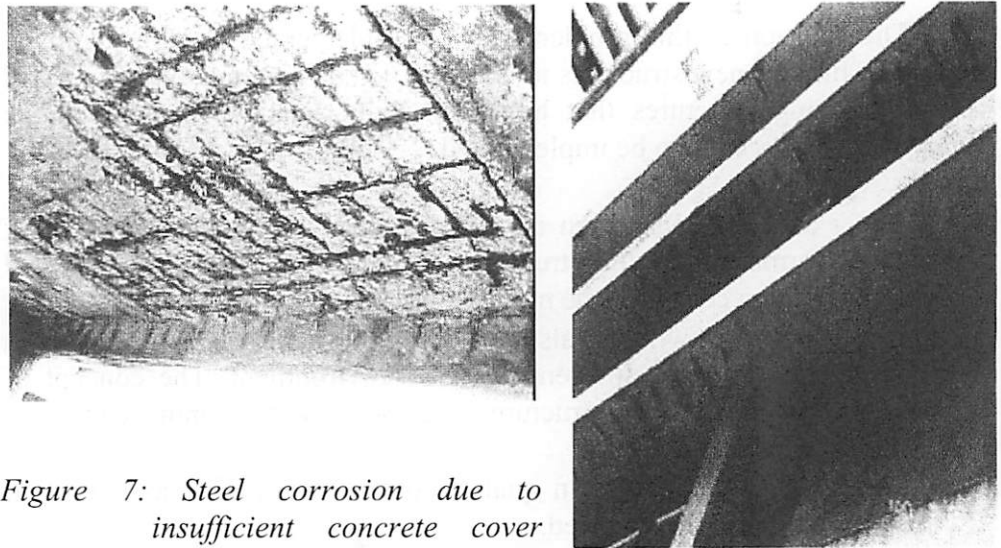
Steel corrosion due to insufficient concrete cover under bridge (left) and under building balconies (right) (Construction problem)
